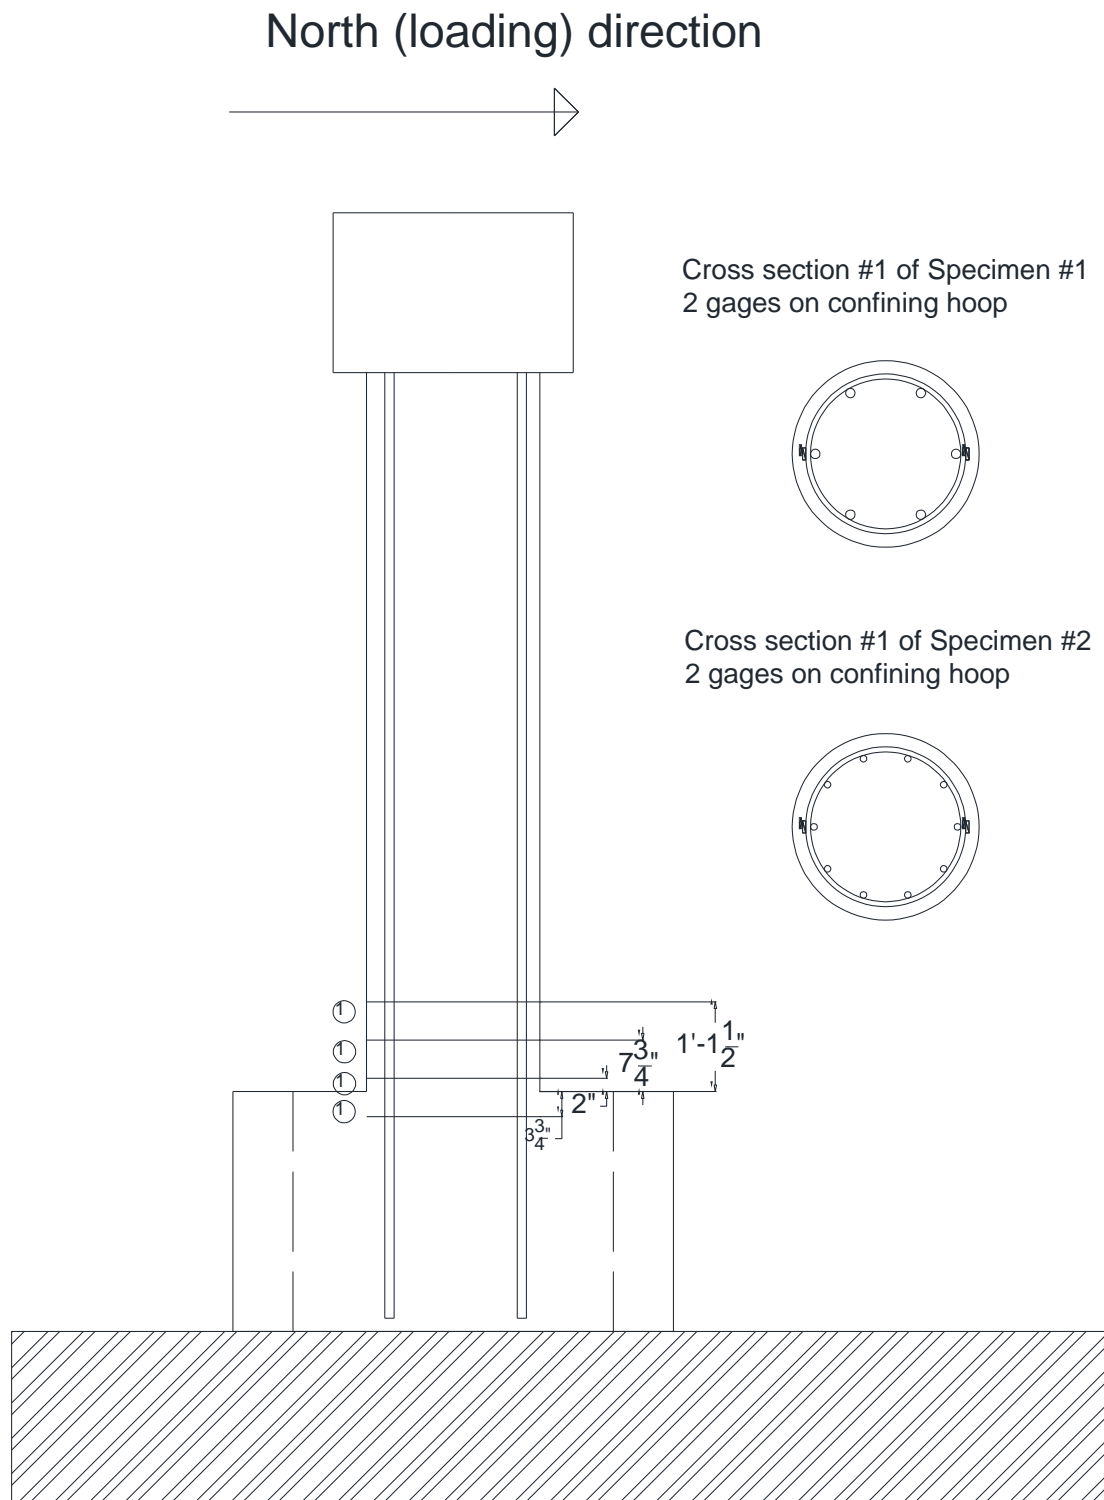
Strain gages on steel hoops of Specimens #1 and #2
